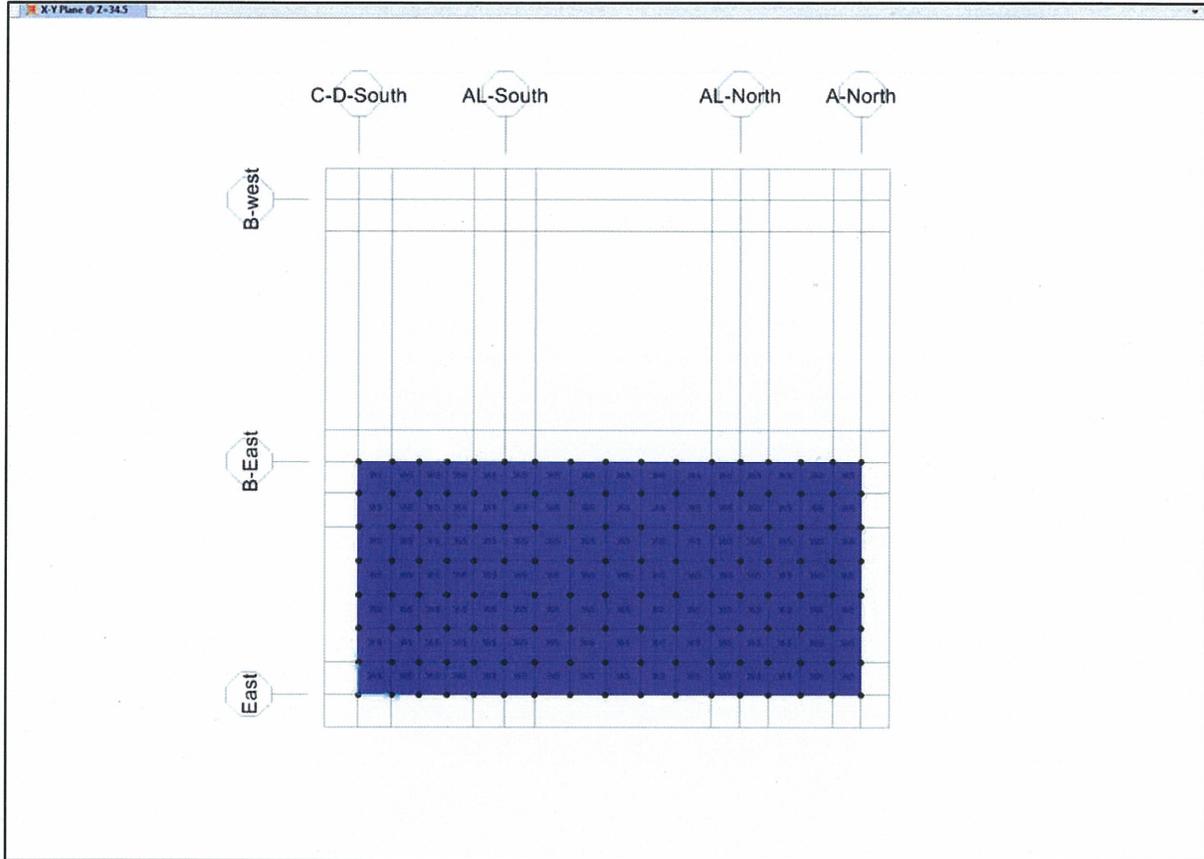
REC SAP2000 Roof Plan at Z = 34.5-ft
